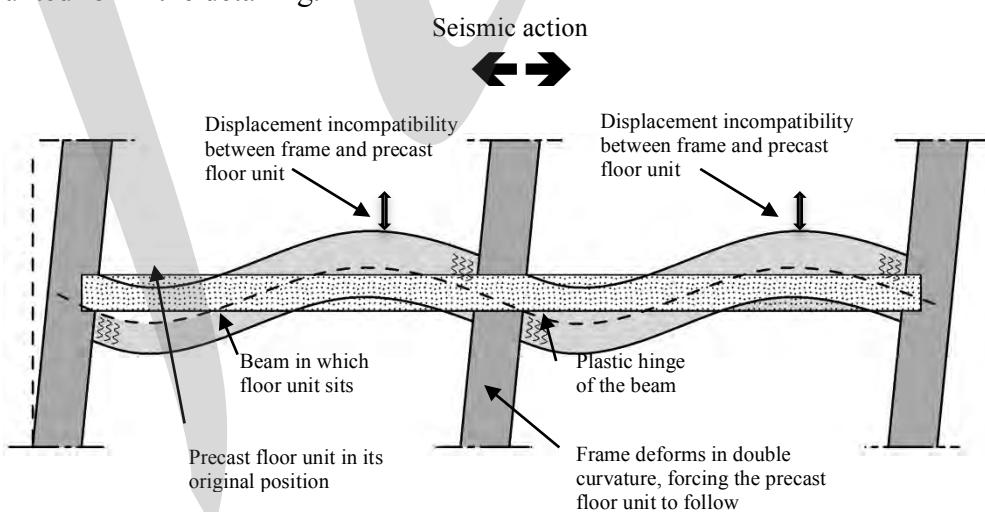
Vertical relative displacement between floor and frame asking for compatibility
